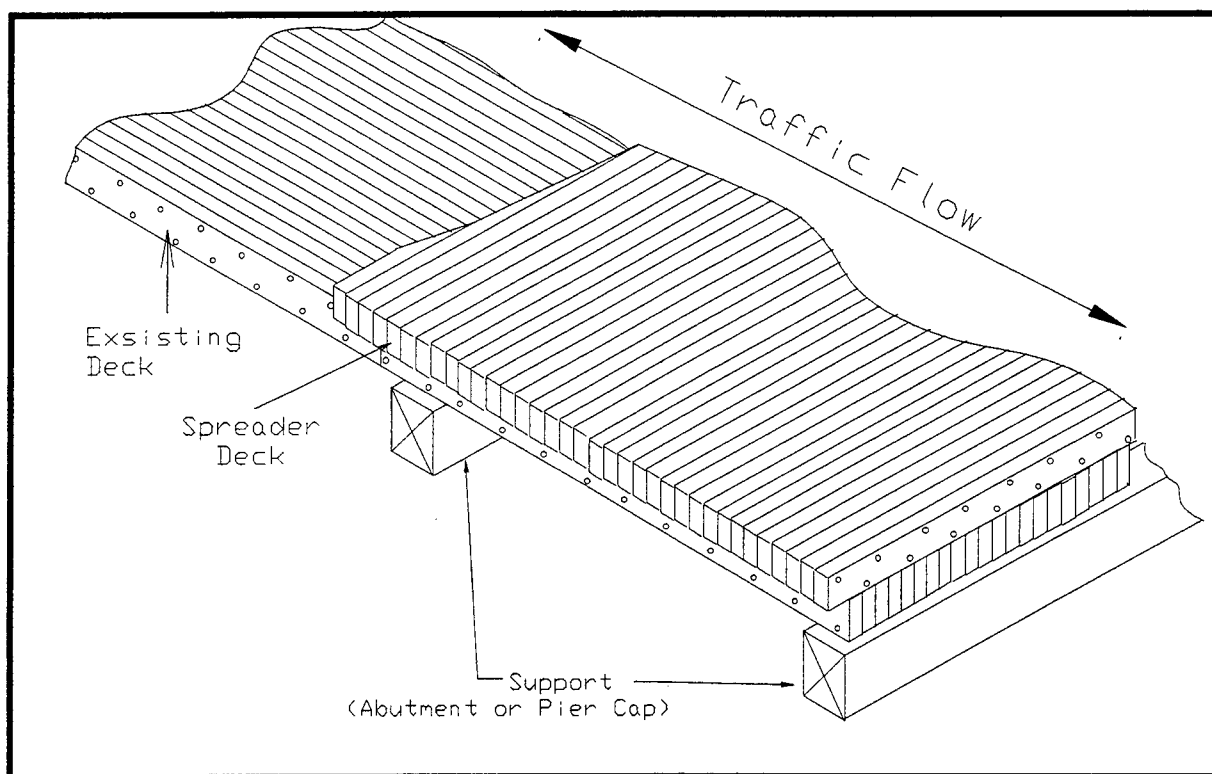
Spreader Deck Rehabilitation of Longitudinal Superstructure Timber Bridge Decks
